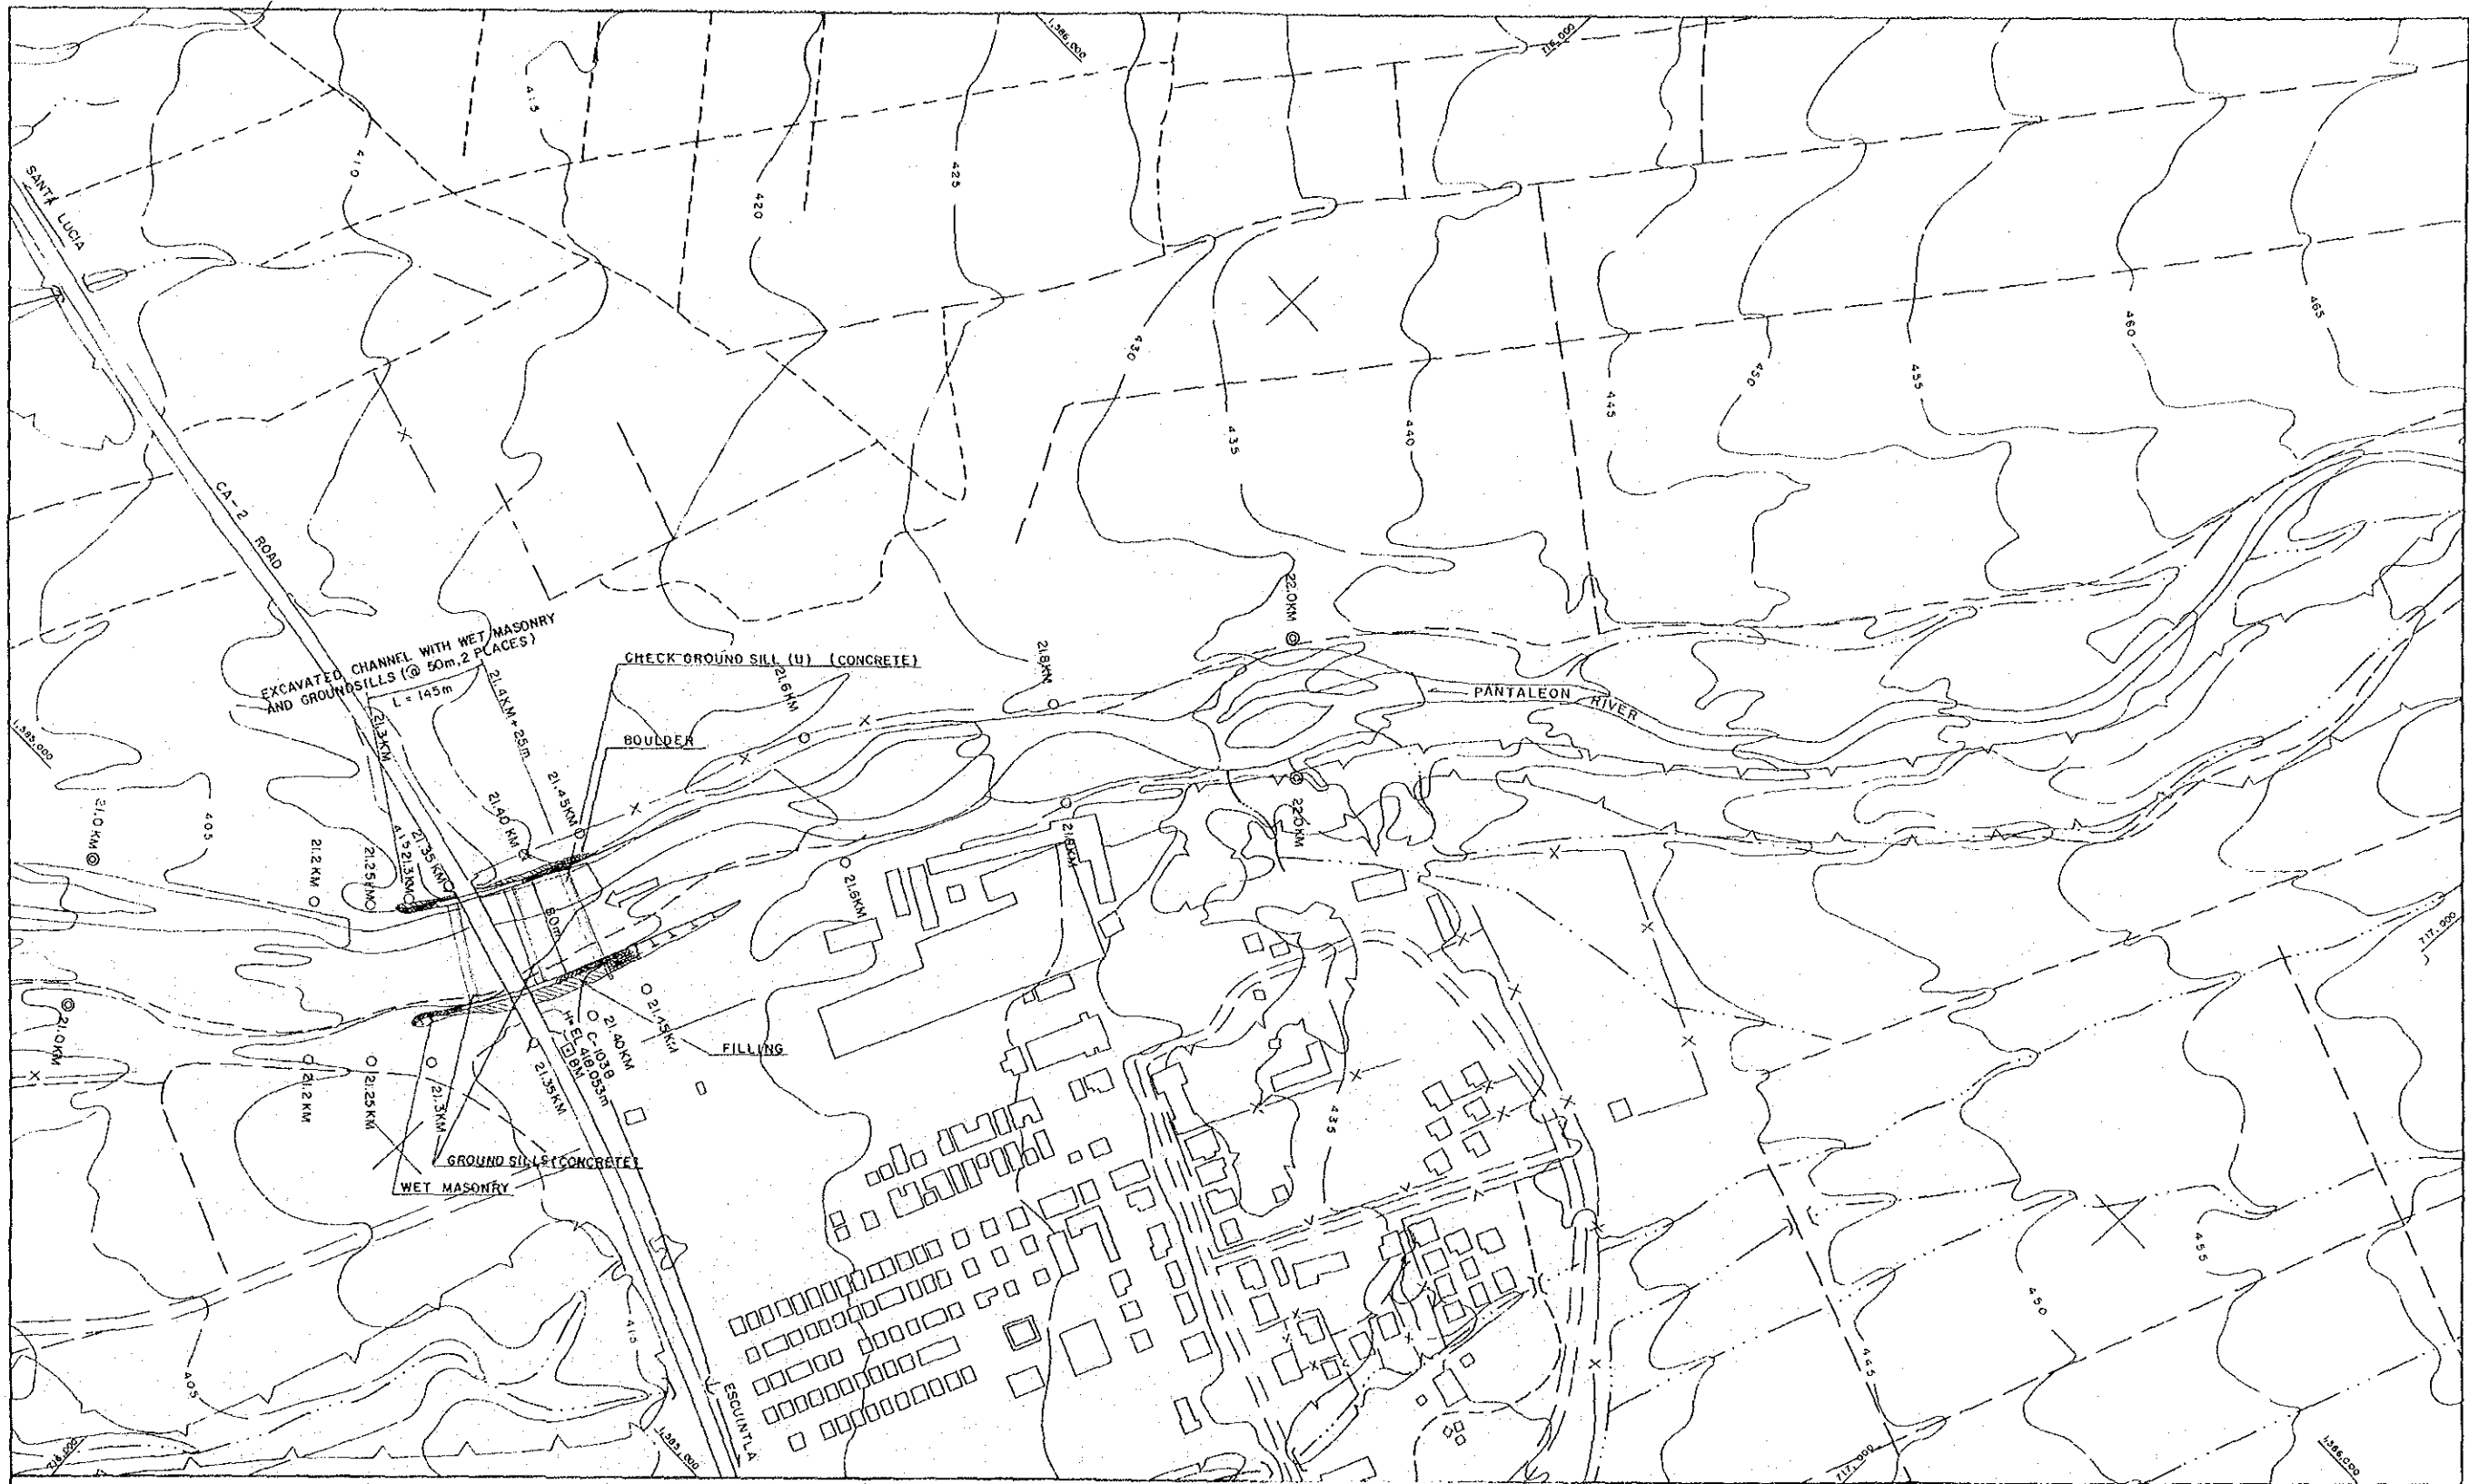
(5/6) PLAN OF RIVER IMPROVEMENT IN THE PROPOSED URGENT PLAN (PANTALEON RIVER)
